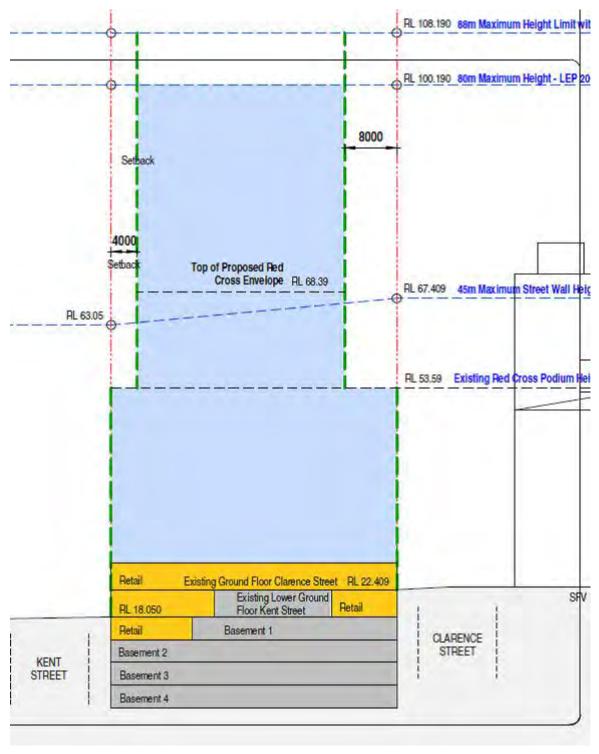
Modified Stage 1 building envelope as viewed in cross section between Clarence Street and Kent Street.
